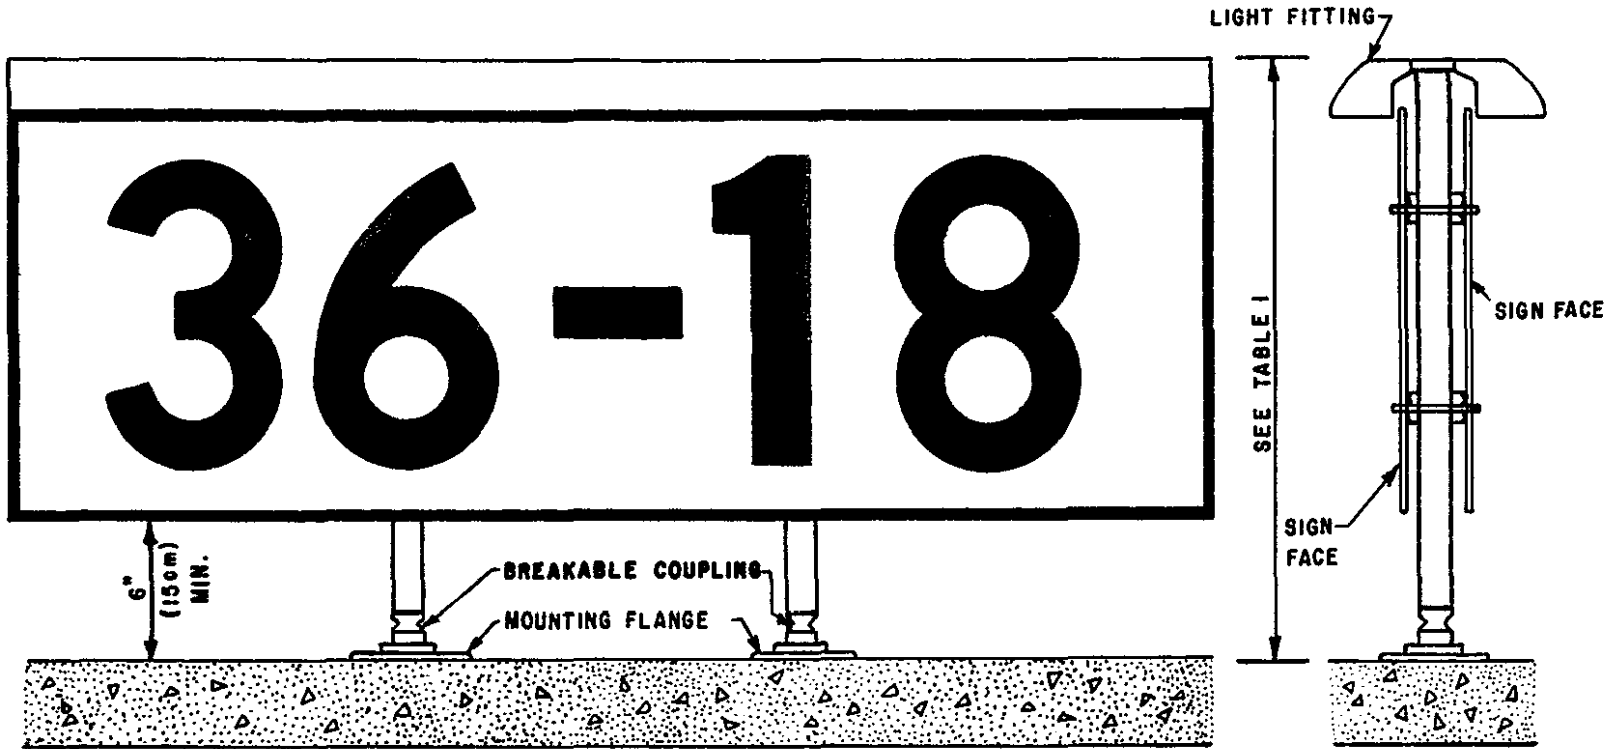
TYPICAL SIGN ASSEMBLY.
